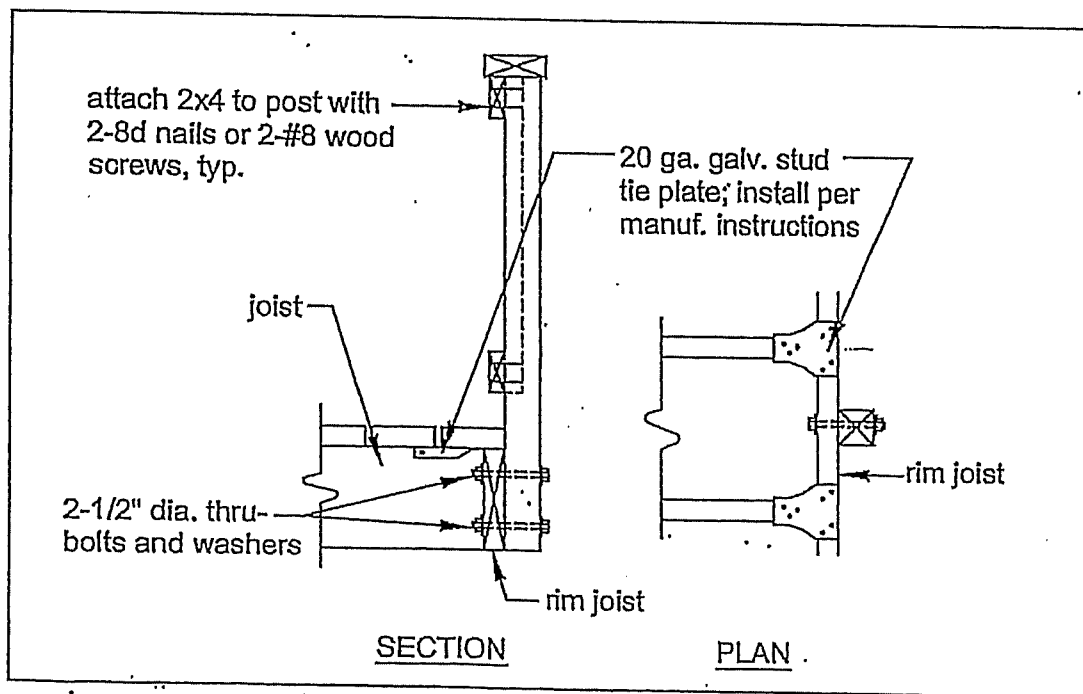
GUARD POST TO RIM JOIST DETAIL, OPTION 2
